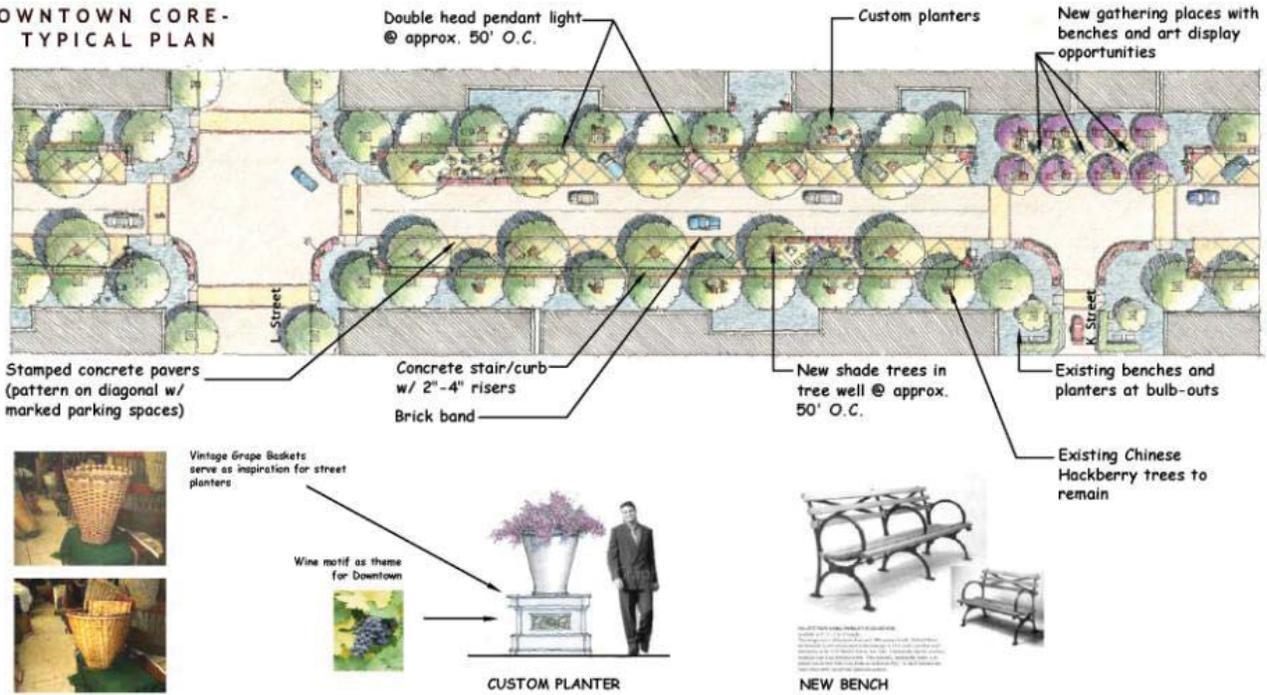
FIRST STREET - DESIGN CONCEPT
